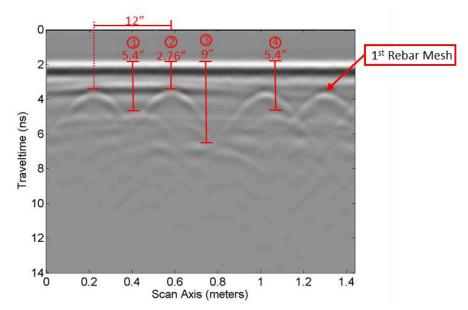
GPR Image (File 135), corresponds to a GPR scan on Area 1 on Bridge 77. Perpendicular to steel bridge deck girder.
